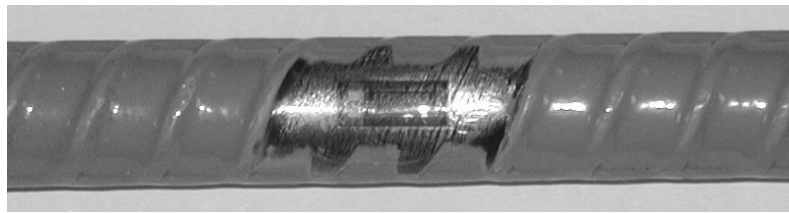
Strain Gages in Deck at Girder 4 over Center Pier
